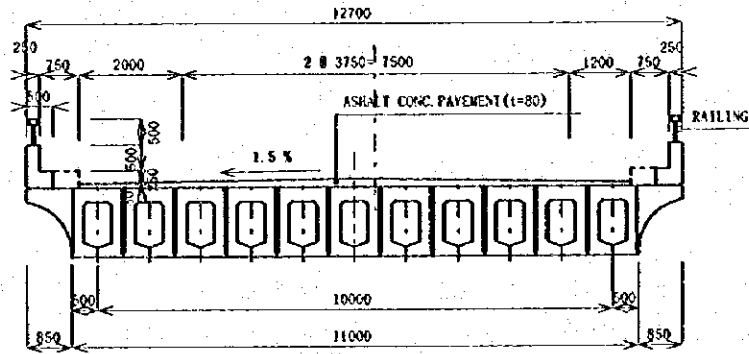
Cross-sectional Details of Super-structure Type 1 Girder
